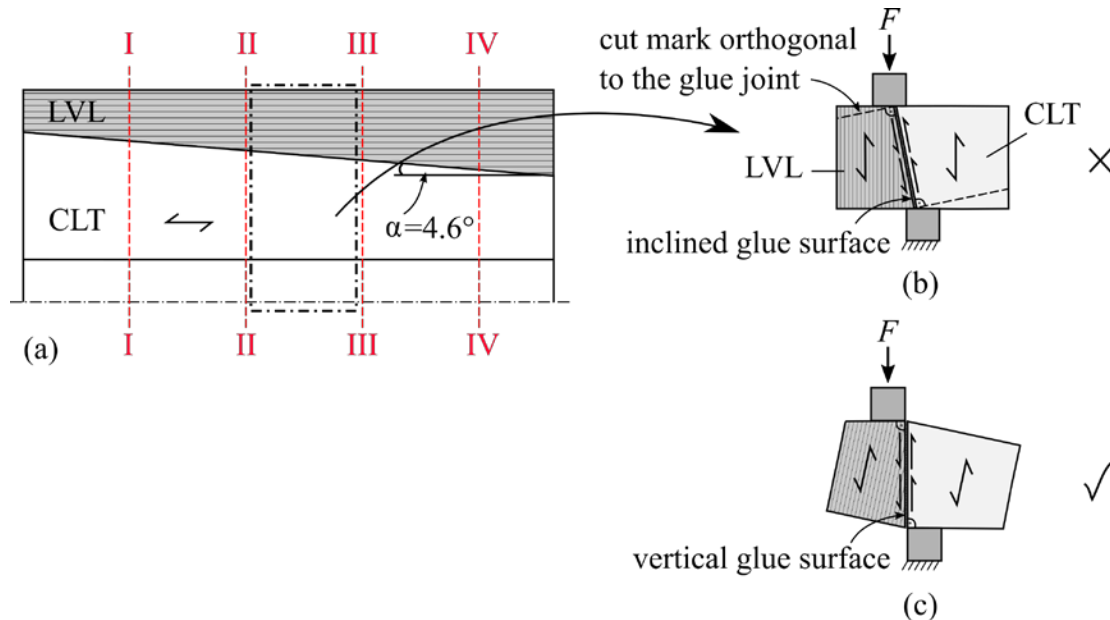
Cutting scheme of block shear specimens of the vertical bond lines; (a) lateral view on cut C–C (see Fig. 6) (b) primary cutting shape (c) final specimen shape with co-linear vertical load and shear planes
